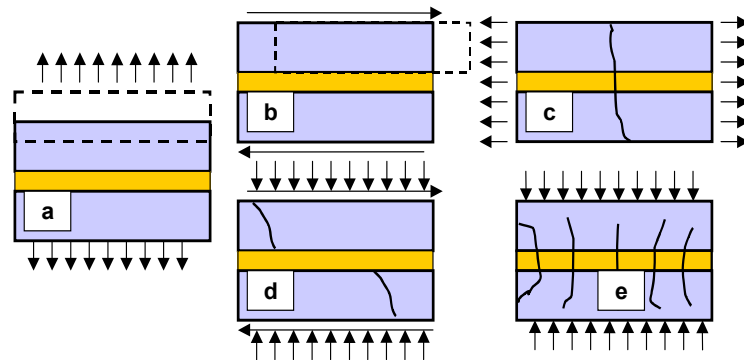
Masonry failure modes a- direct tensile cracking of joint, b-sliding along joint c-cracking of unit and joint, diagonal tensile cracking of units e-compressive failure due to mortar militancy (Idris et al, 2009).
